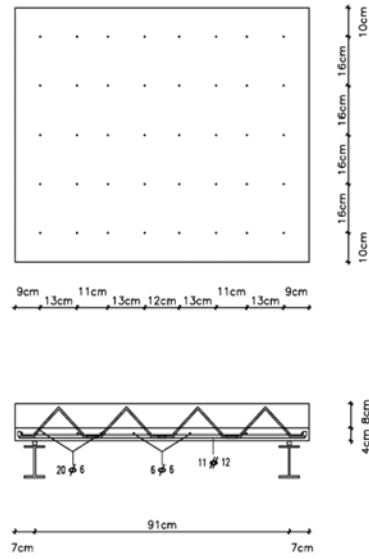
Typical dimensions and reinforcement of composite pre-slabs (S13)
